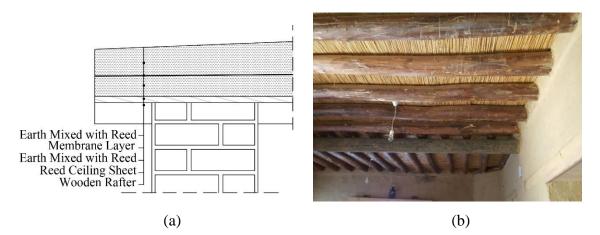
Section of the roof (a) and view of the roof (b) of the case building (Photography: Ekin G. Yöney, (2019), Location: Fethiye, Muğla)
